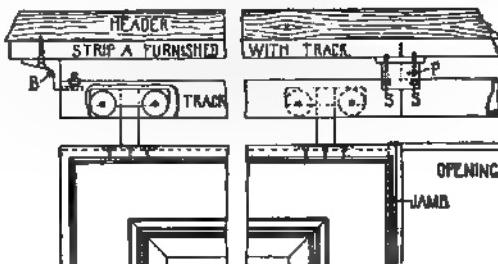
Detail Showing Hanging of Door on Trolley-Track.
